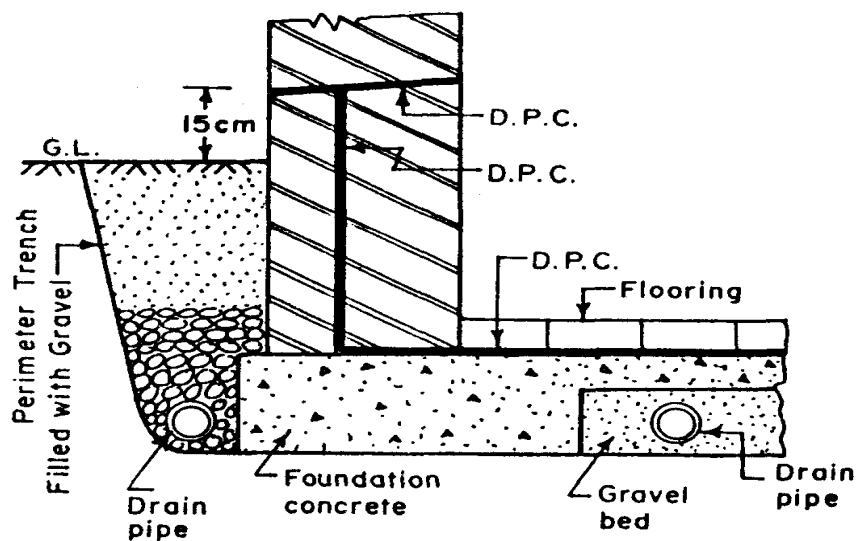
FIG D.P.C. TREATMENT FOR BASEMENT ON UNDRAINED SOIL
